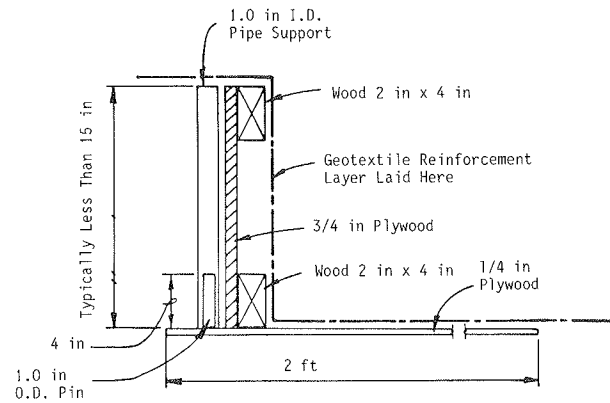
Geotextile reinforced wall, U.S. Forest Service construction procedure. [After Bell et al., 1983]
